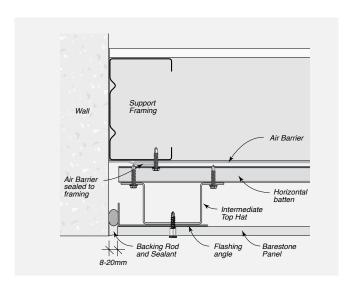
Vertical Gasket and Fixing Detail for Half-bond Panel Layout
